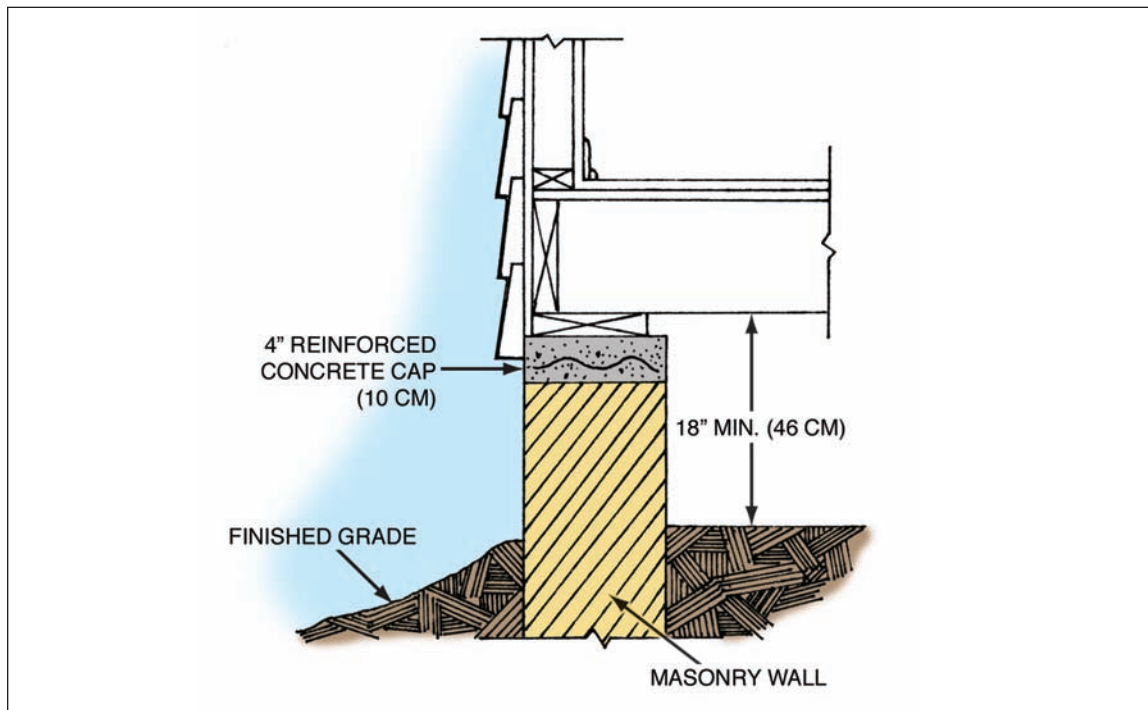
Reinforced poured concrete cap on masonry walls prevents hidden attack by termites. Clearance between the floor and soil should be at least 18 inches (46 cm).
